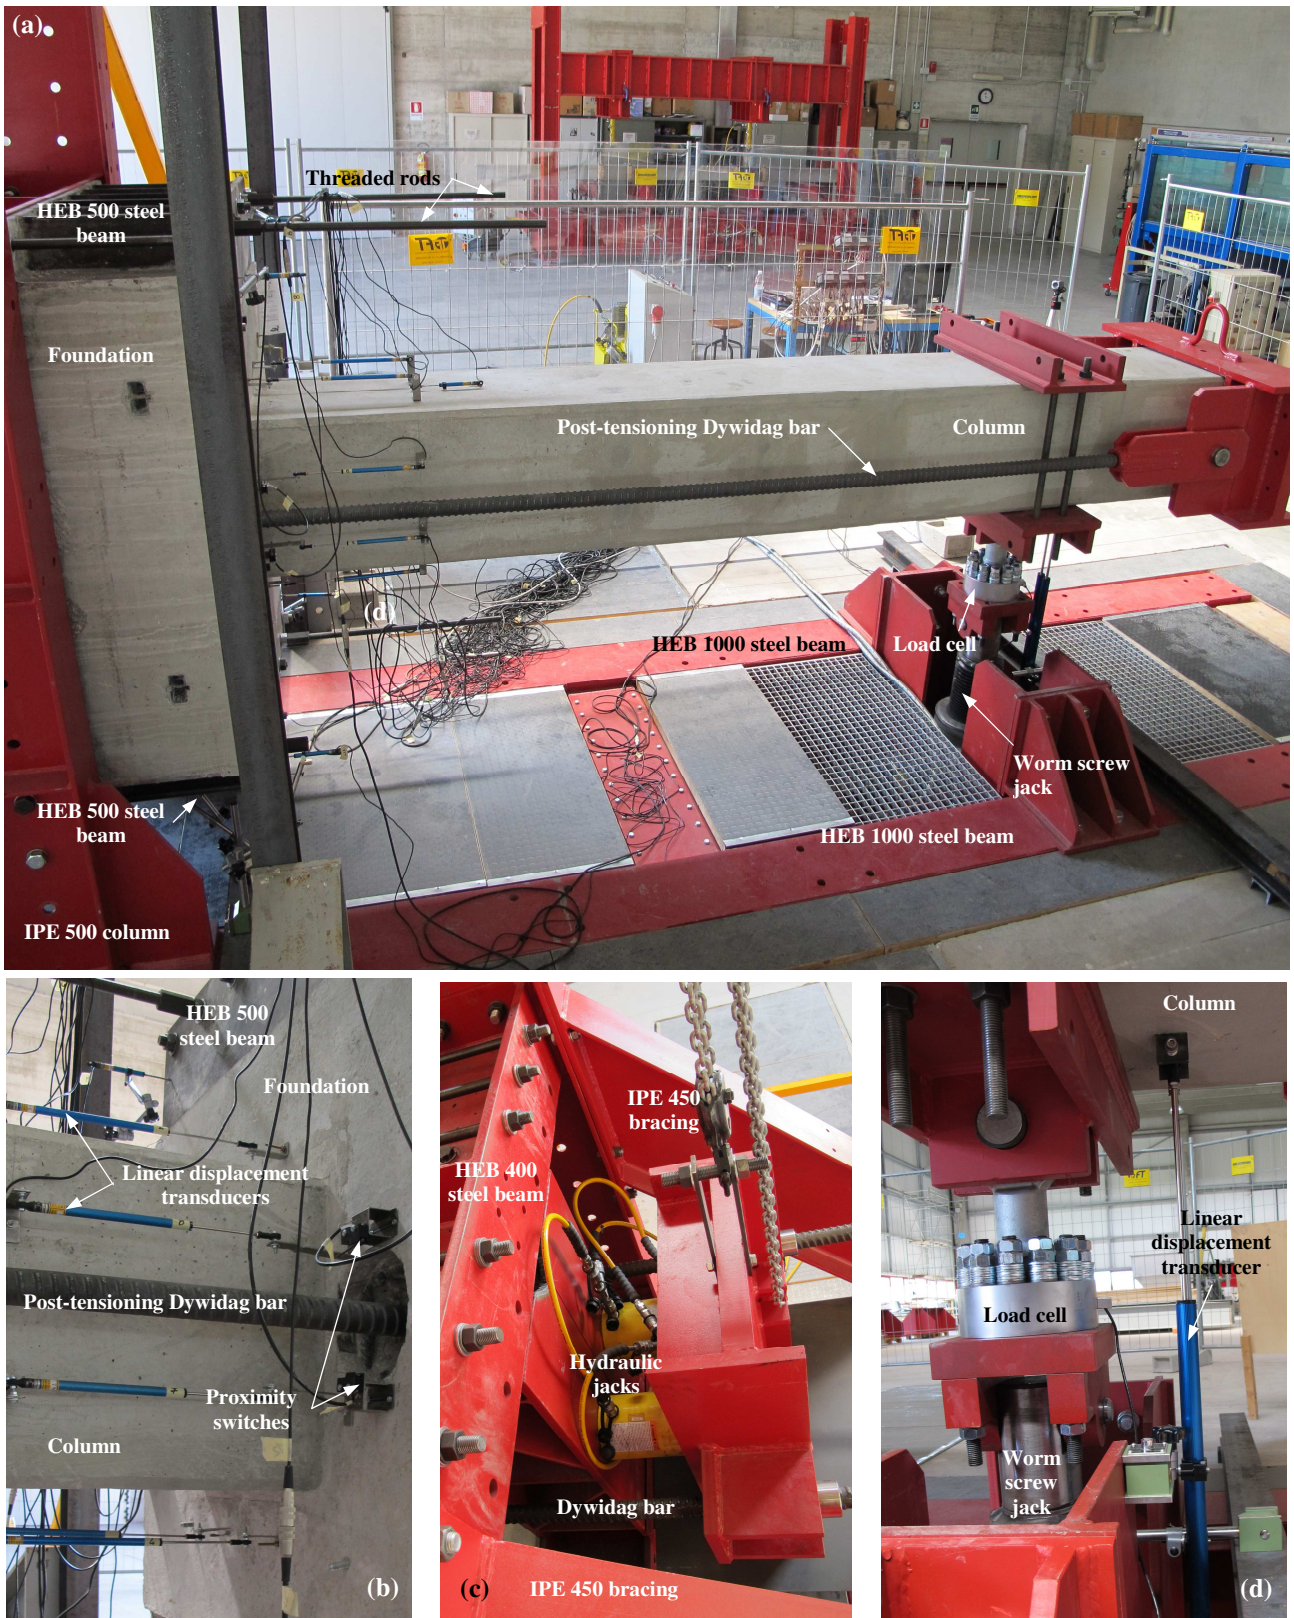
Specimen installed into the reaction frame: (a) side view; detail views showing (b) the column-to-foundation connection with one of the Dywidag bars for post-tensioning and linear displacement transducers for strain measurements, (c) the two hydraulic jacks used to apply the constant axial load, and (d) the worm screw jack used to apply the cyclic transverse force
